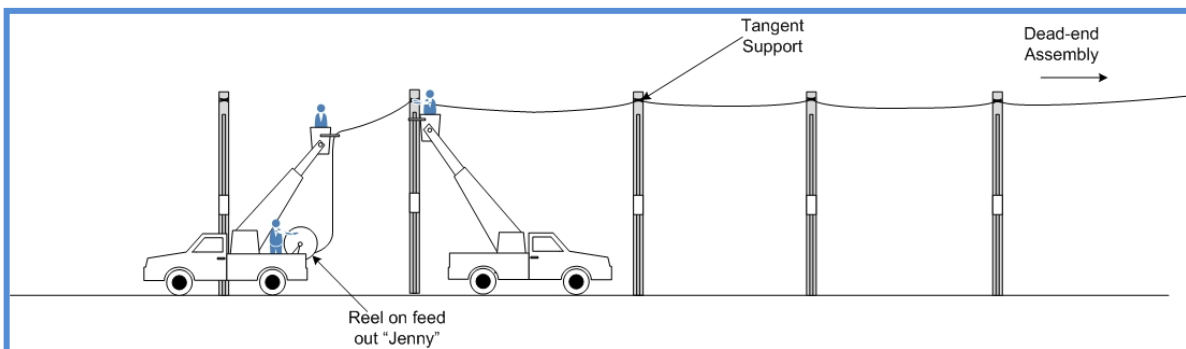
Illustration of the Moving Reel Method for ADSS cable installation
